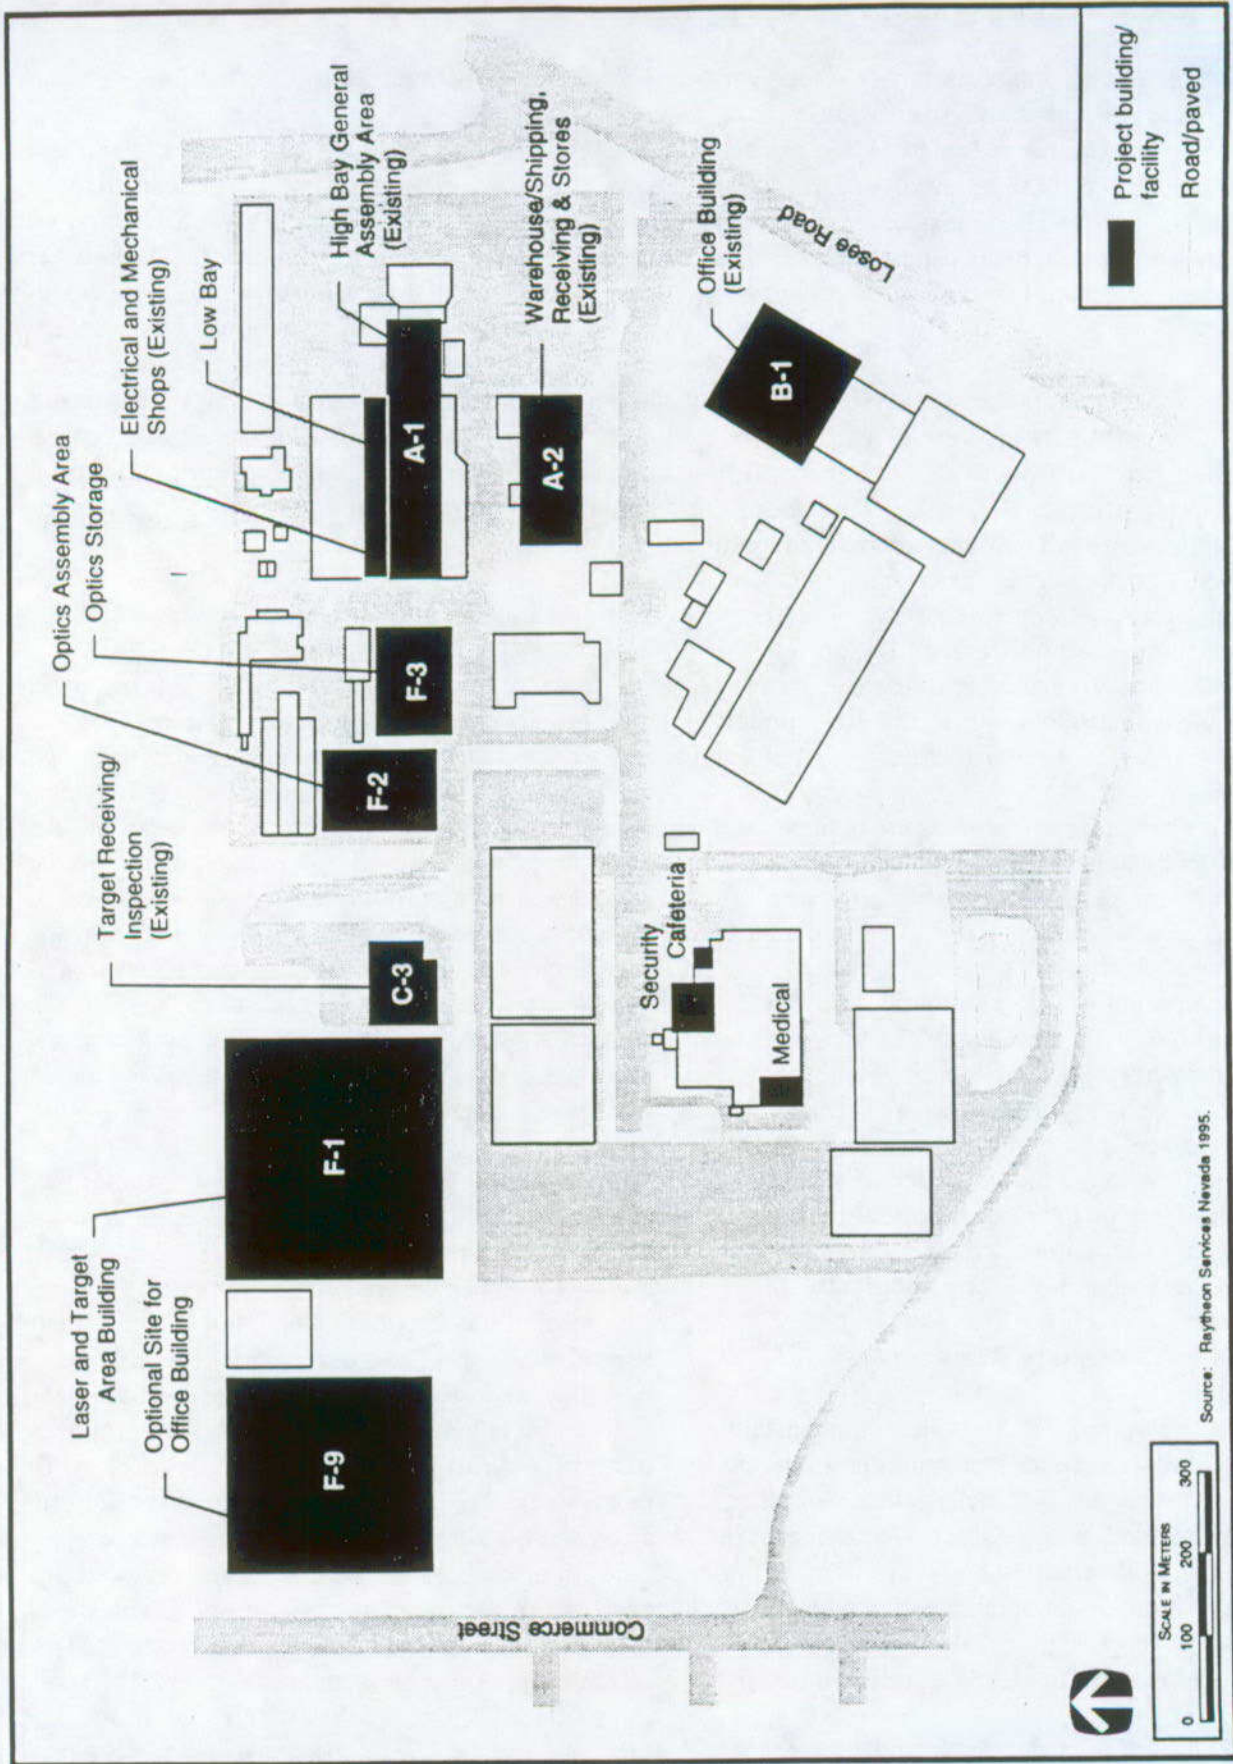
Proposed Location for the National Ignition Facility at North Las Vegas Facility.
